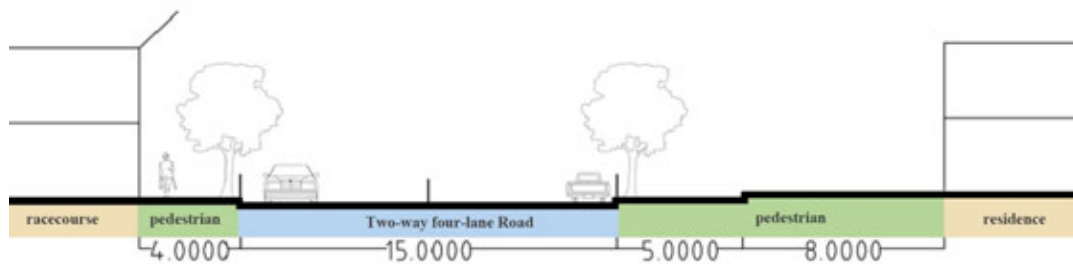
Section of Tancun Road (Source: drawn by author)
